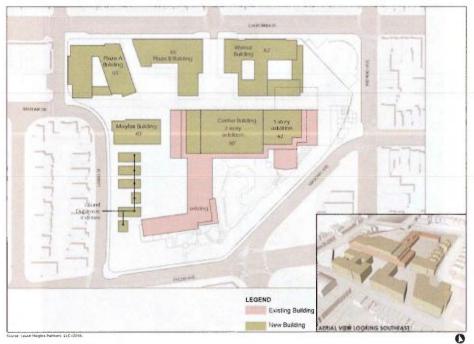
ALTERNATIVE E: PARTIAL PRESERVATION - RESIDENTIAL ALTERNATIVE SITE PLAN
